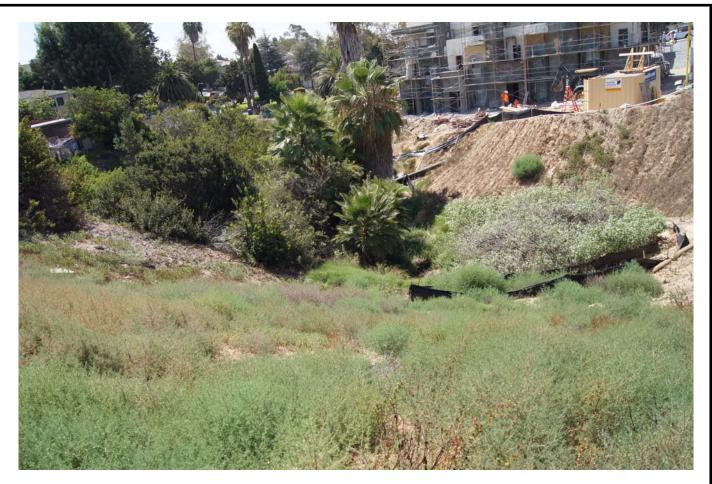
Looking north at the Stormwater Outlet and manufactured slope off of B Street (July, 2013)
